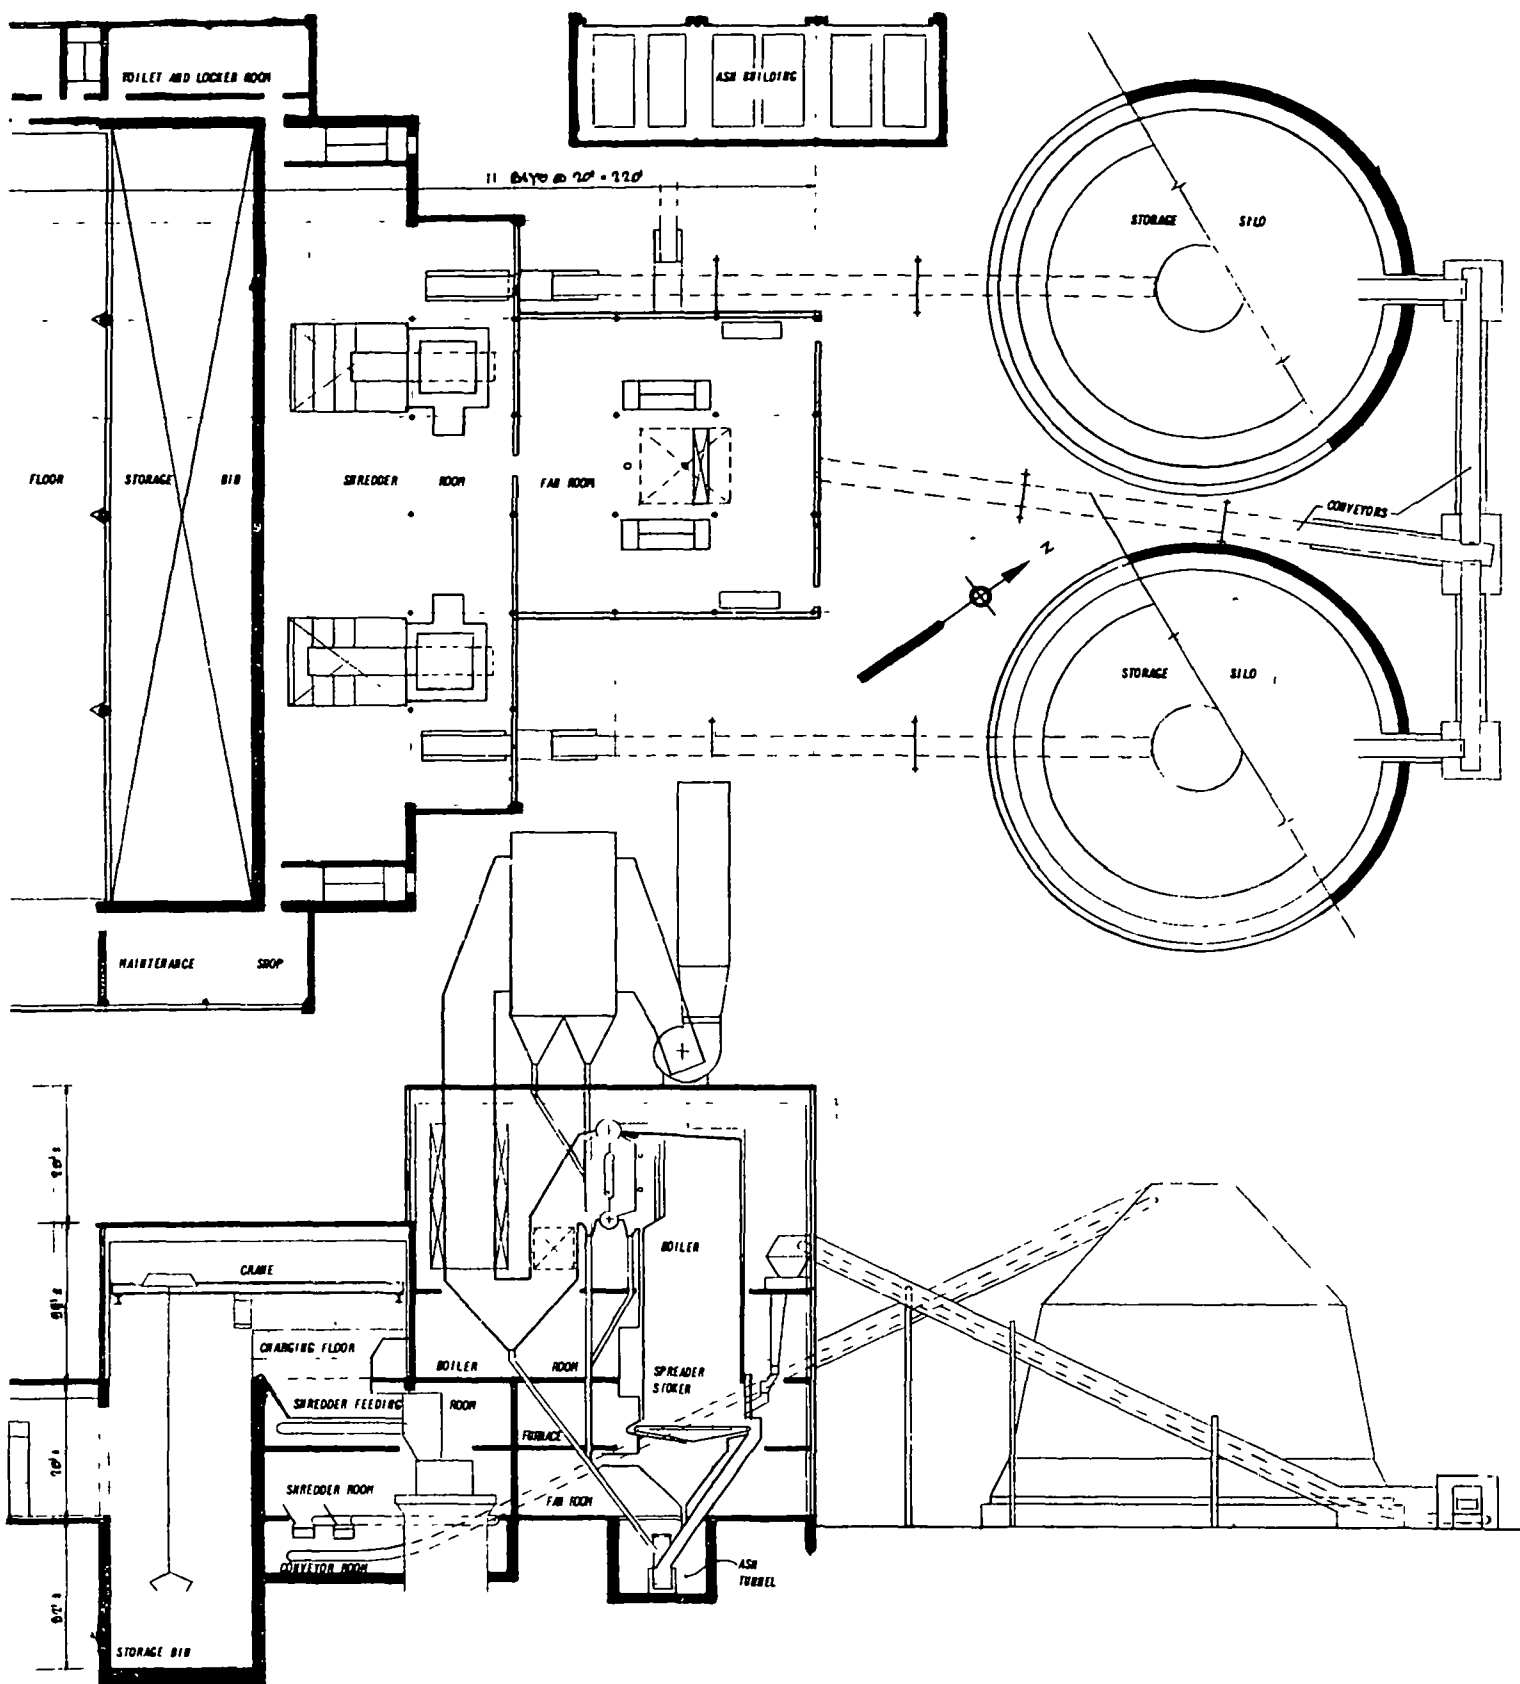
ALTERNATIVE B-11 - SITE PLAN
